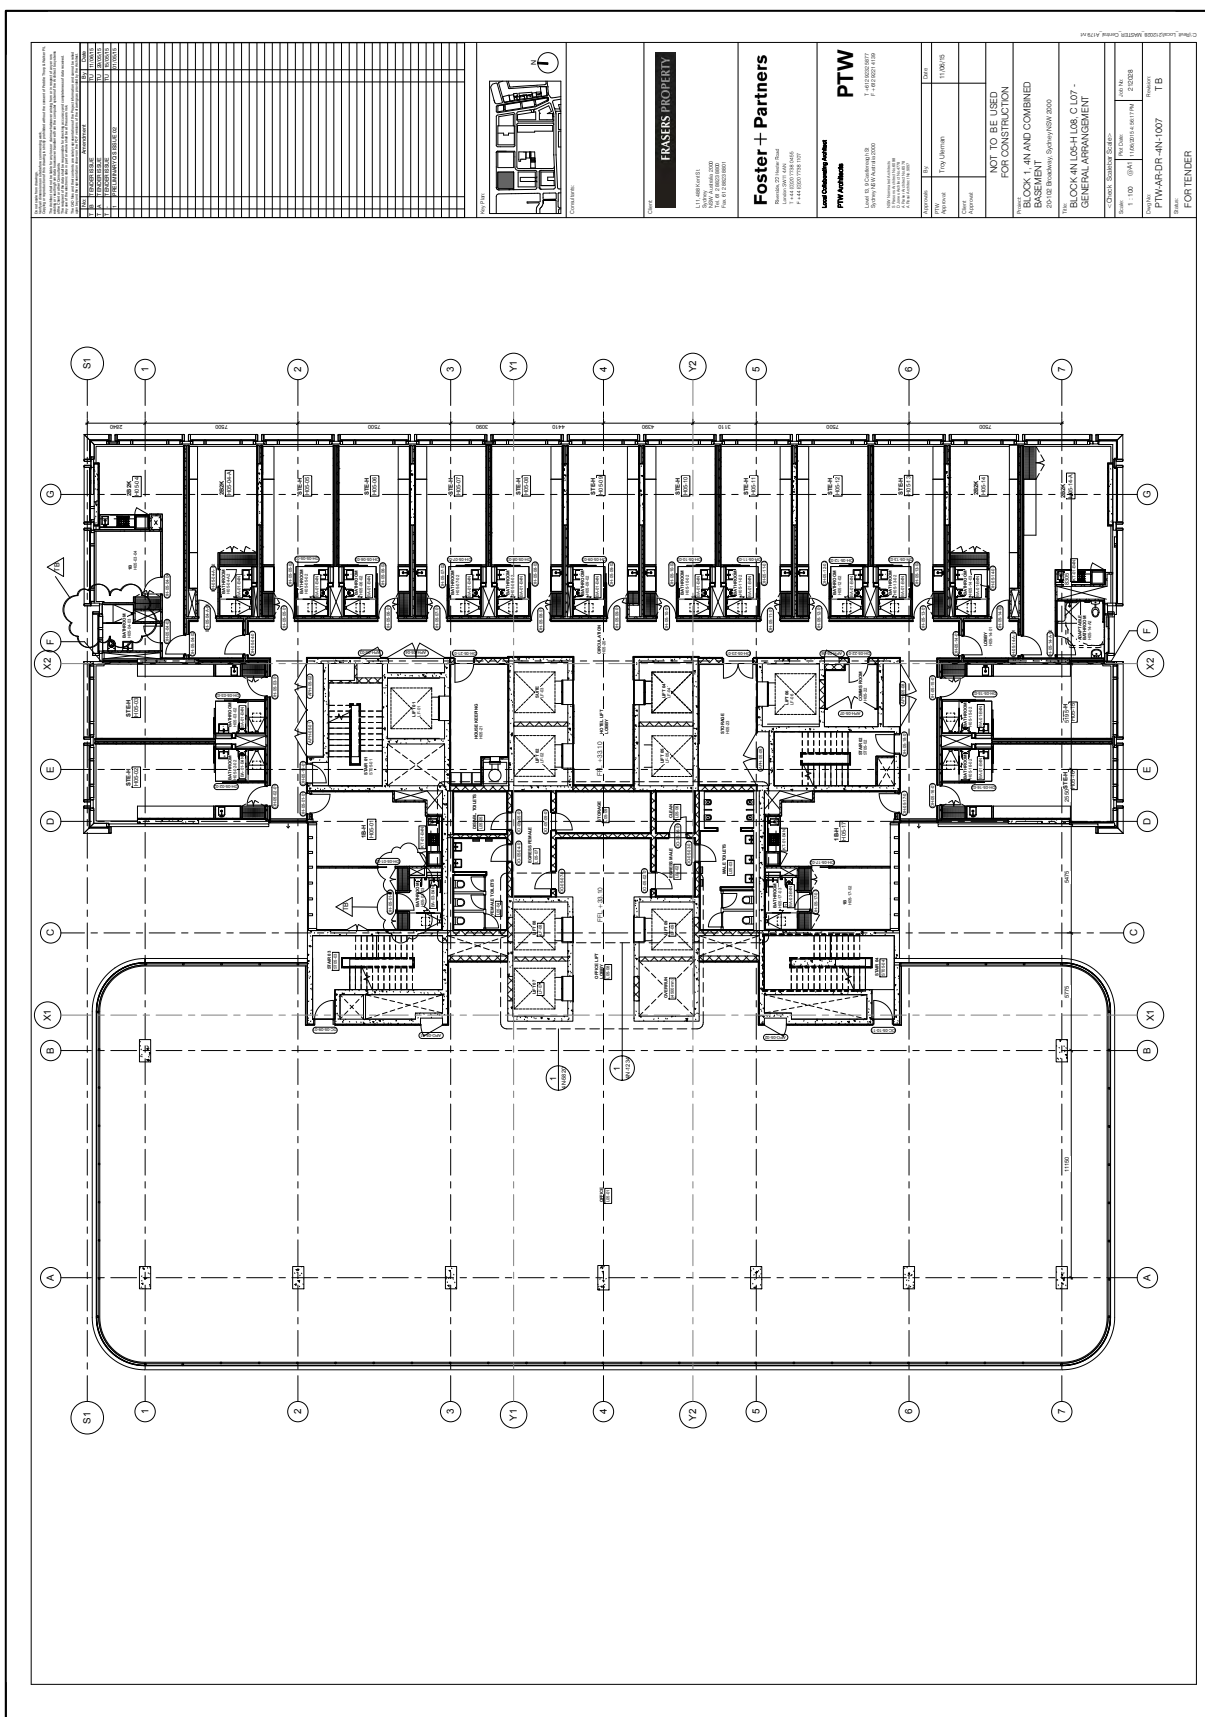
Base Building Plan – Typical Floor Level 5-10 as approved.
